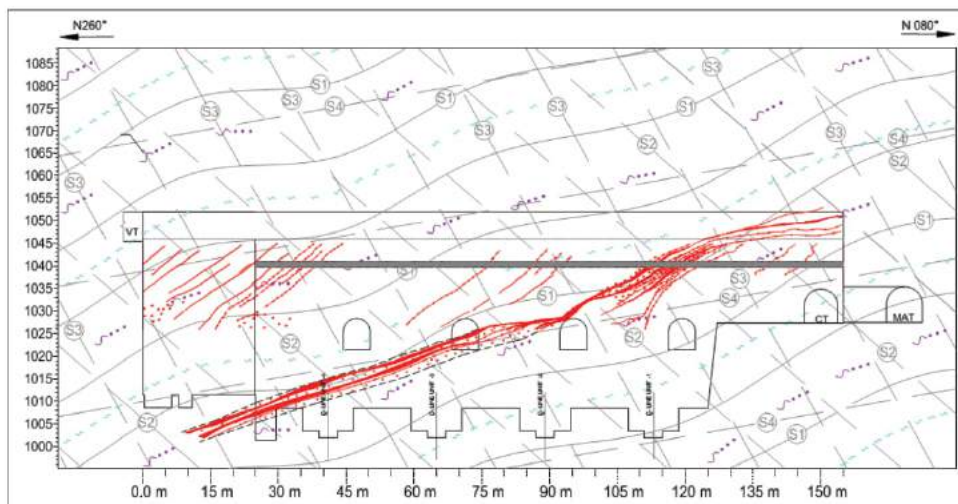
Geological section along downstream wall of power house cavern showing disposition of shear zone
